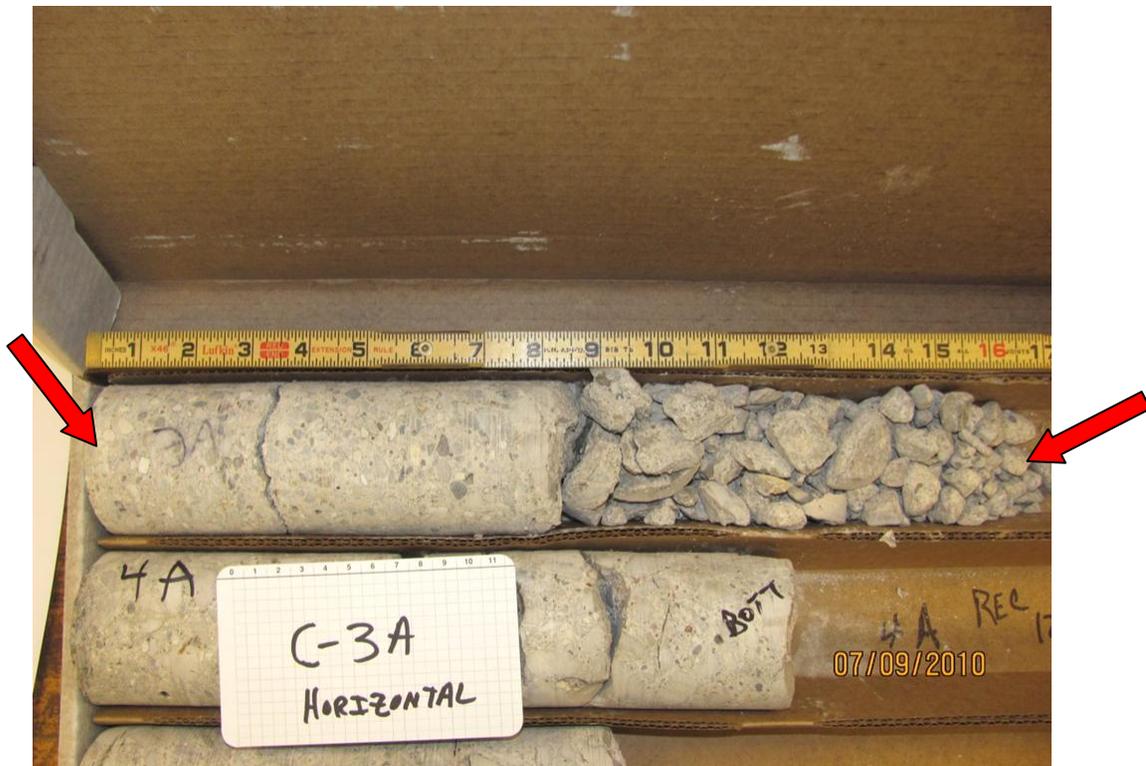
View of Core C-3A (between arrows). Note concrete for first 9-inches is previous repair material. The remainder is original deteriorated concrete.
